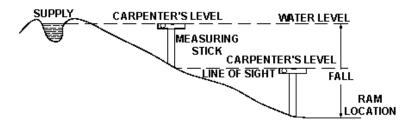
Determining Vertical Fall (F) and Lift Elevation (E) Using a Carpenter's Level
